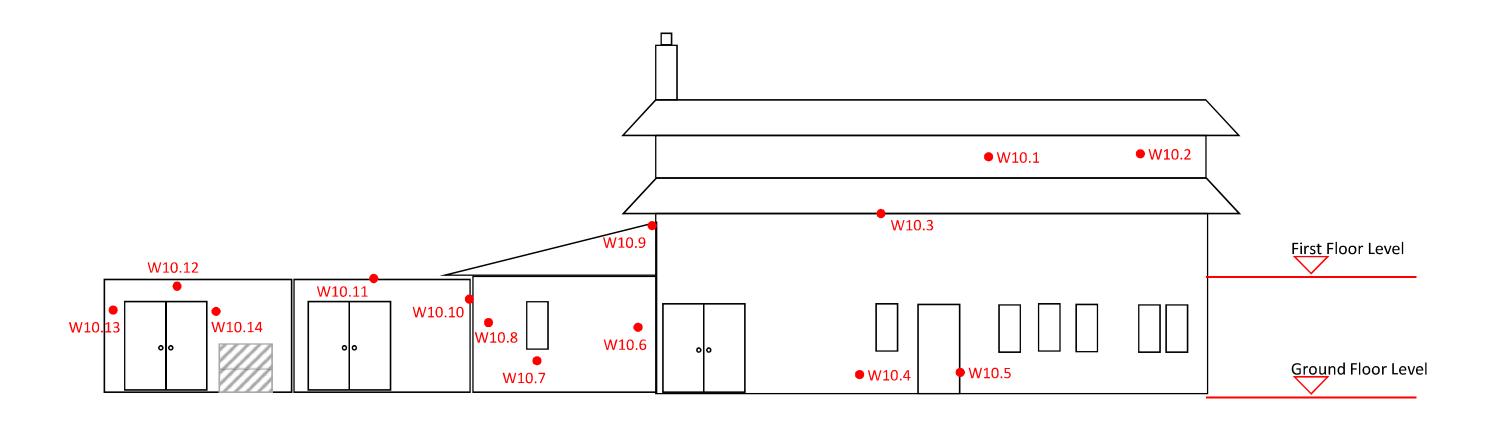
Elevation W10 of Station Hotel Building showing Defect/Observation Locations
